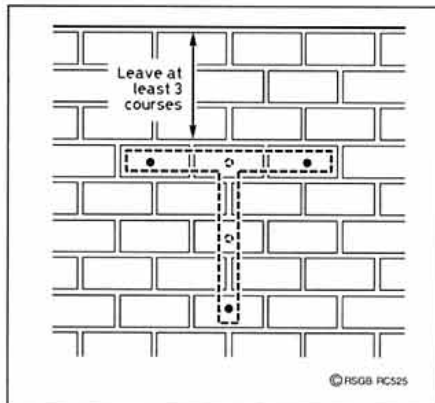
Typical drilling pattern for wall bracket. Patterns may vary, but always drill into the centres of the bricks.
